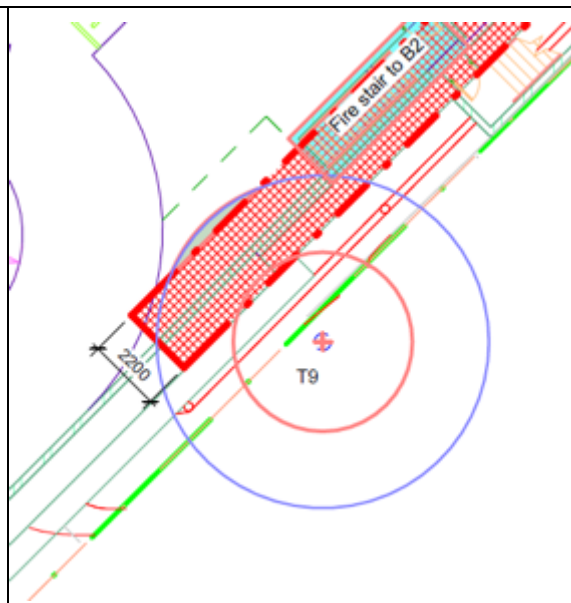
Basement 1 Plan – Tree 9 - Showing suspended slab (couter level).
